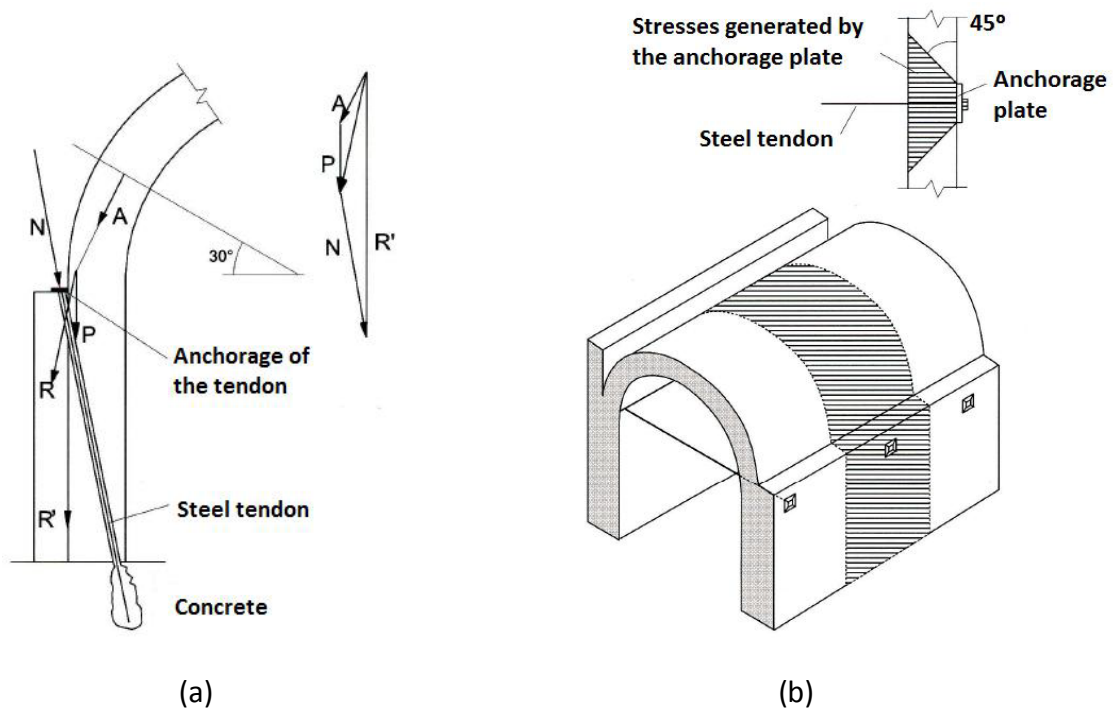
Post-tensioned steel tendons in vaulted structures; (a) internal application (vertically) and (b) external application (horizontally) [Meli, 1998]
